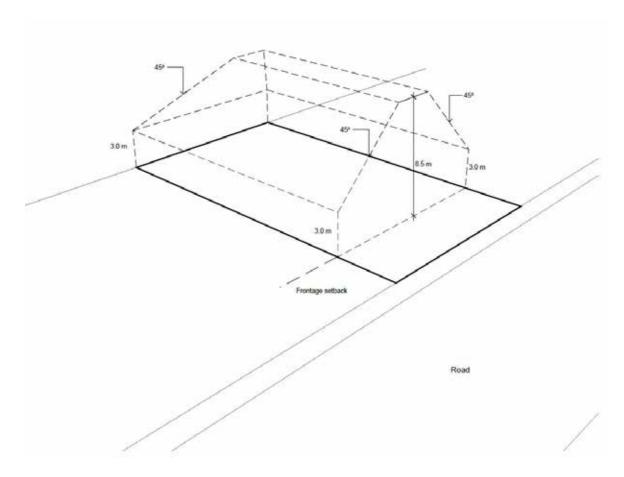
Building envelope as required by clause 10.4.2 A3(a)
